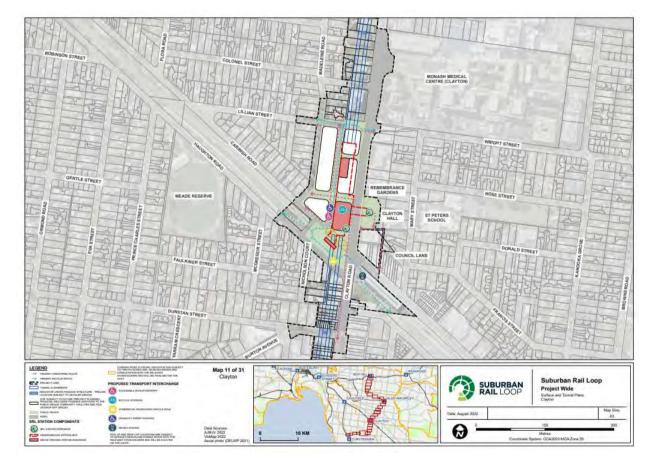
CLAYTON SURFACE AND TUNNEL PLAN
